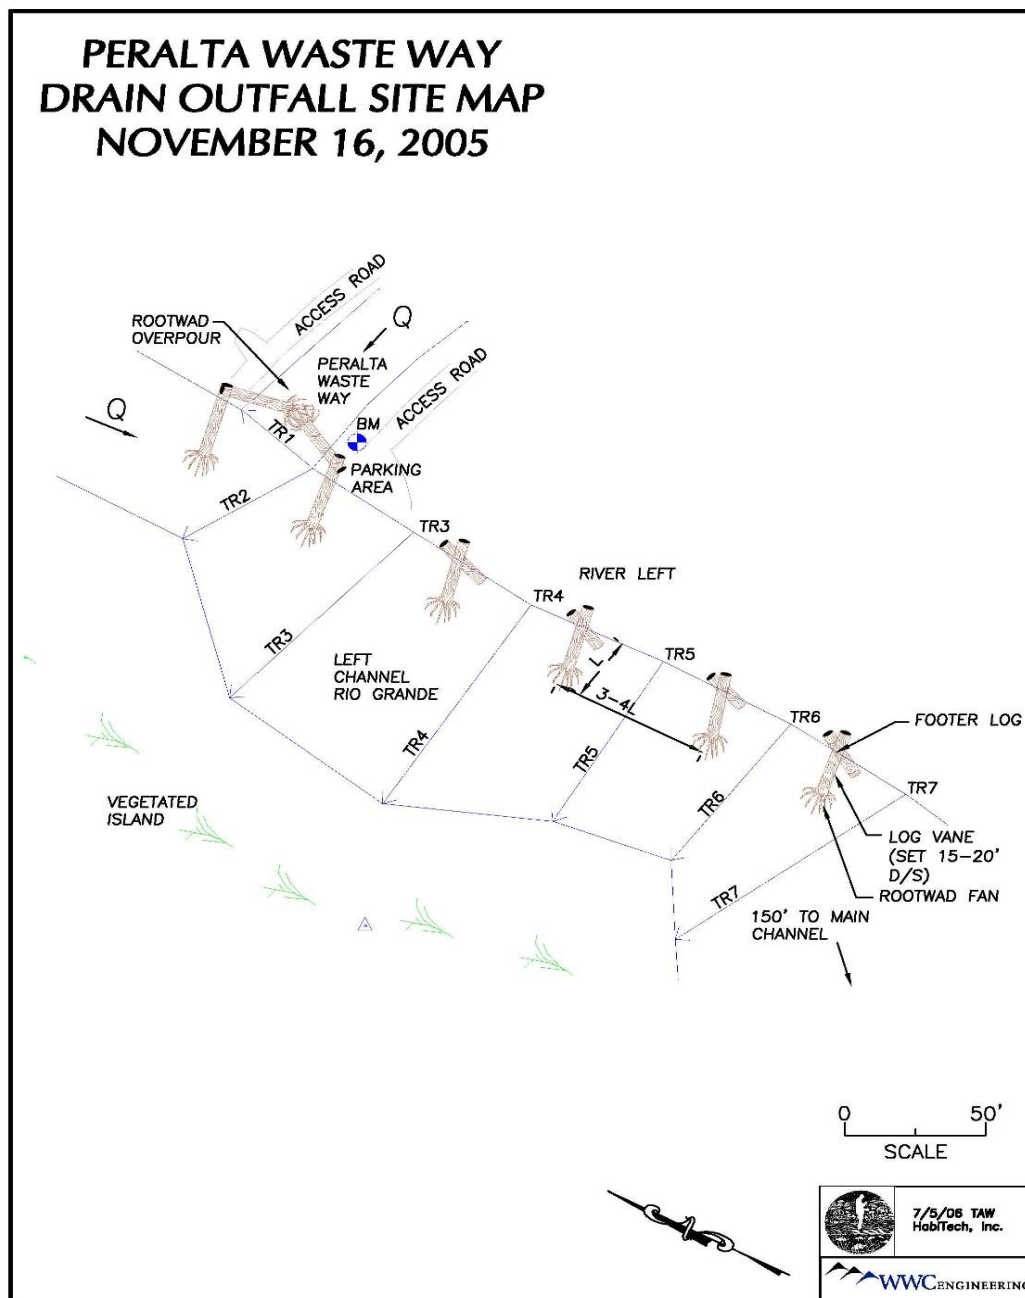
Site Plan for the Peralta Wasteway Drain Outfall.
